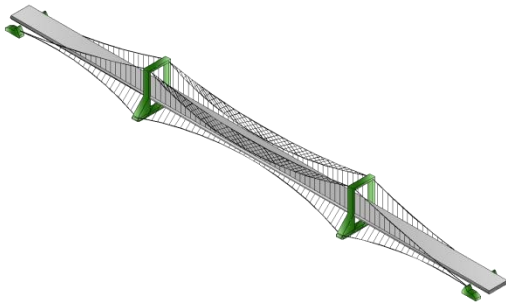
Prestressed suspension bridge with cable truss load carrying structure
